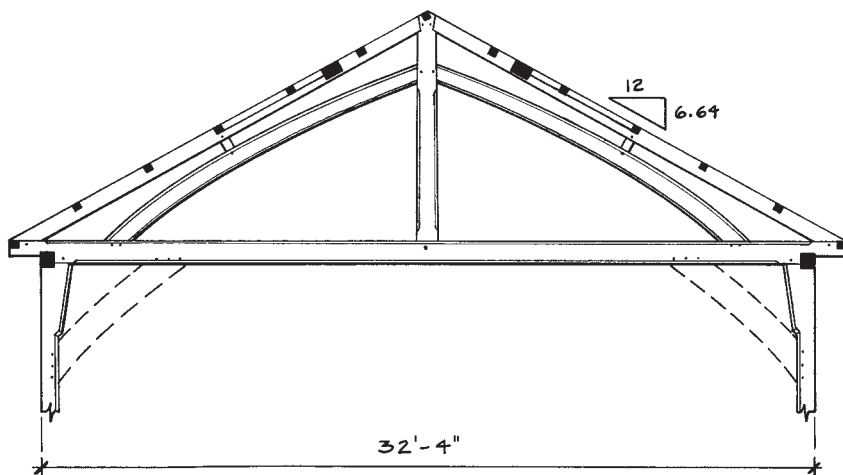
LYNNFIELD (MASS.) MEETINGHOUSE ORIGINAL TRUSS, 1714.
